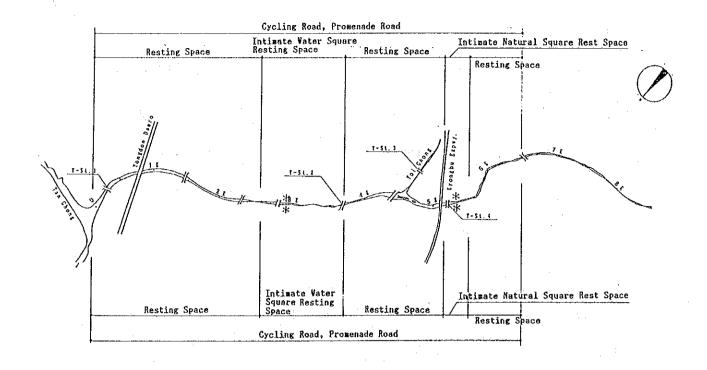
E Proposed Facility Plan of Yangjae Chong
